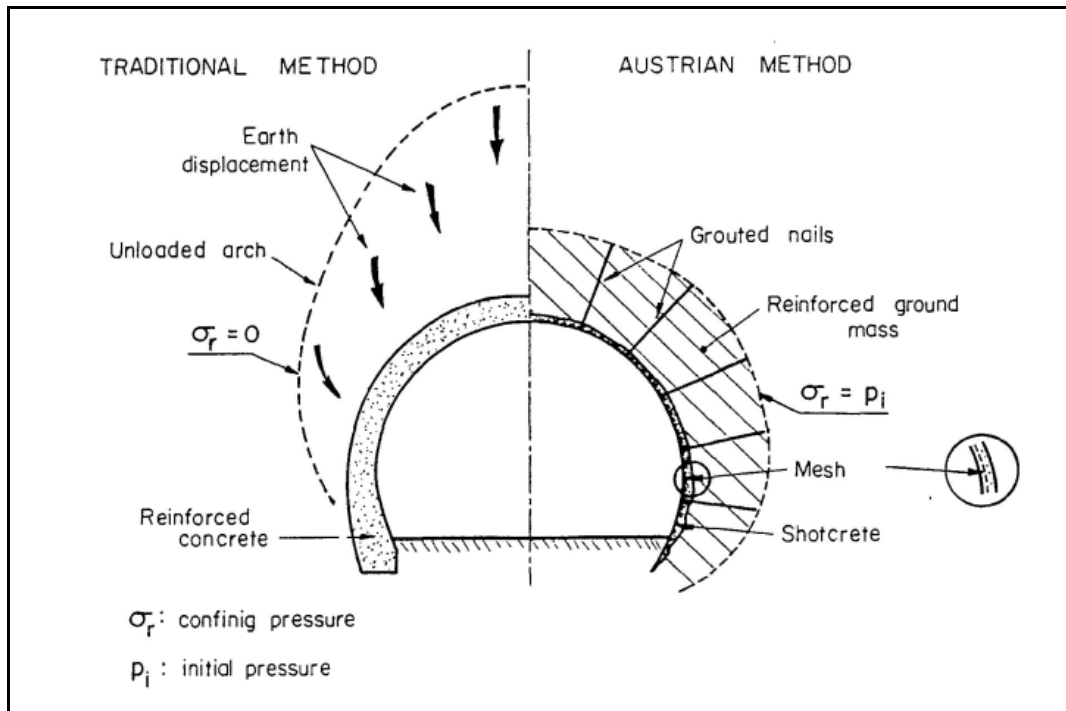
Comparison of the New Austrian Tunneling Method and a traditional method of supporting an underground gallery (Bruce and Jewell, 1986)
